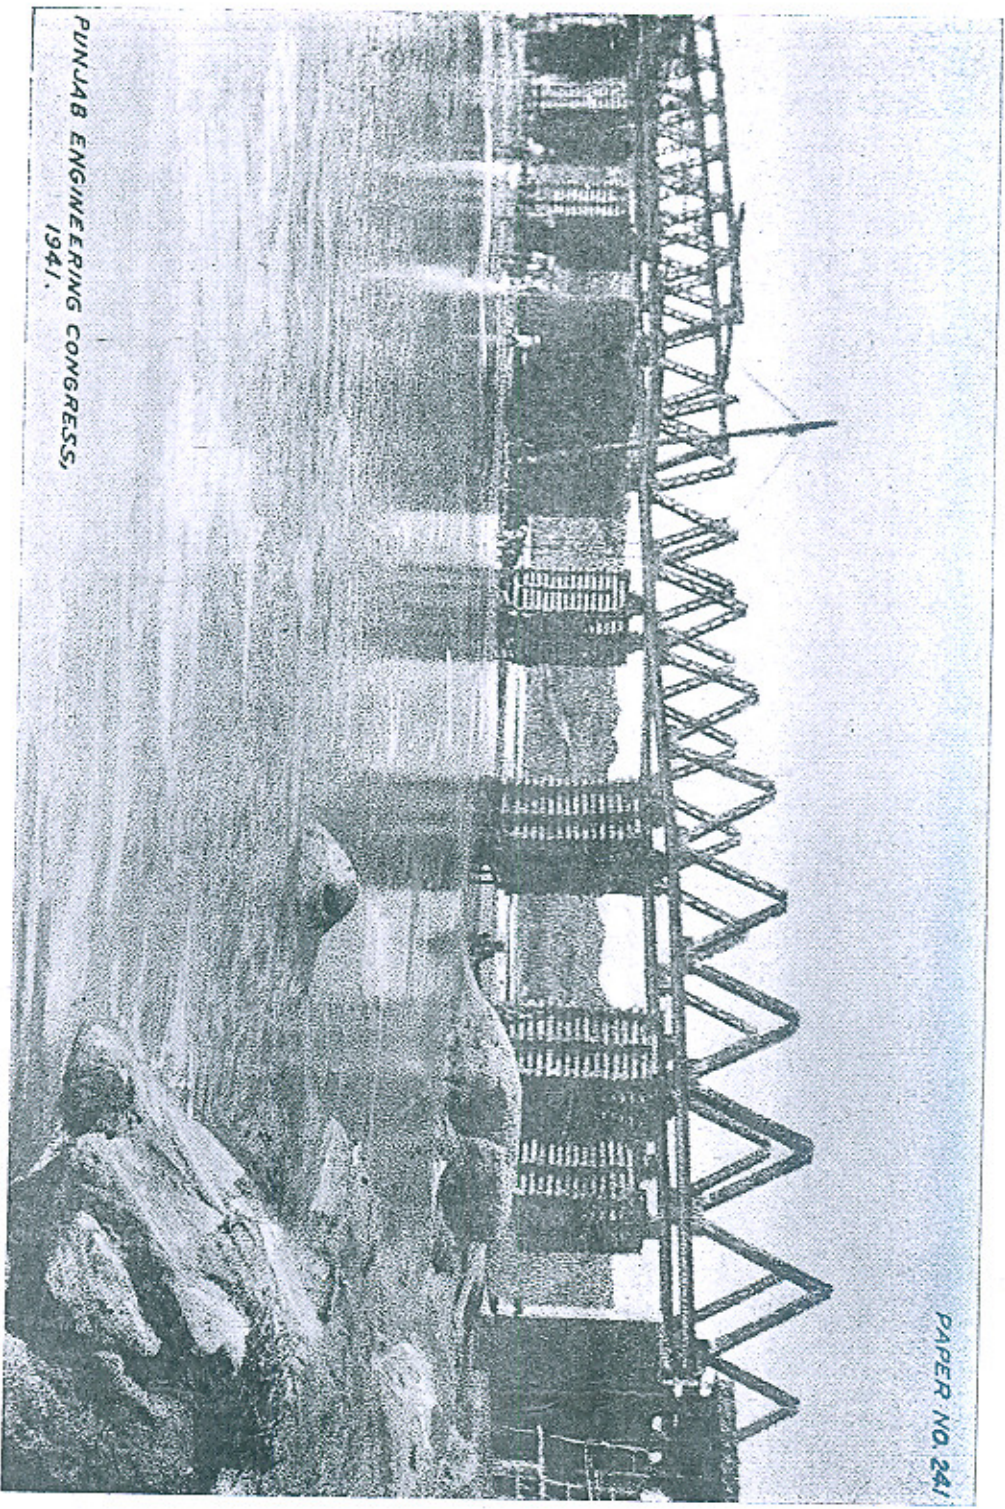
DHOKPATHAN BRIDGE,
